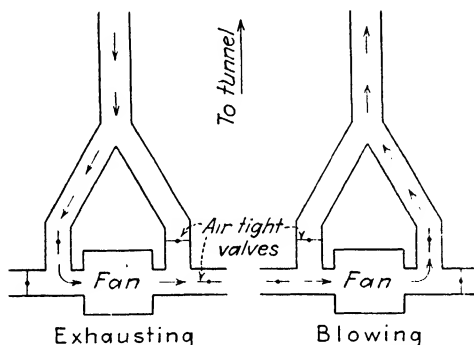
Simple valve arrangement for reversing flow of ventilating air without reversing the fan.
